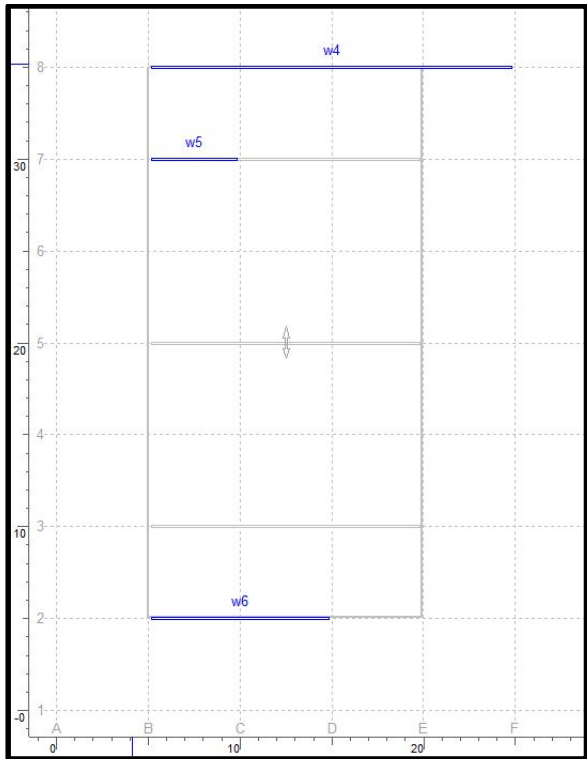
Partial Wall on Joist Area Second Floor Wall View
